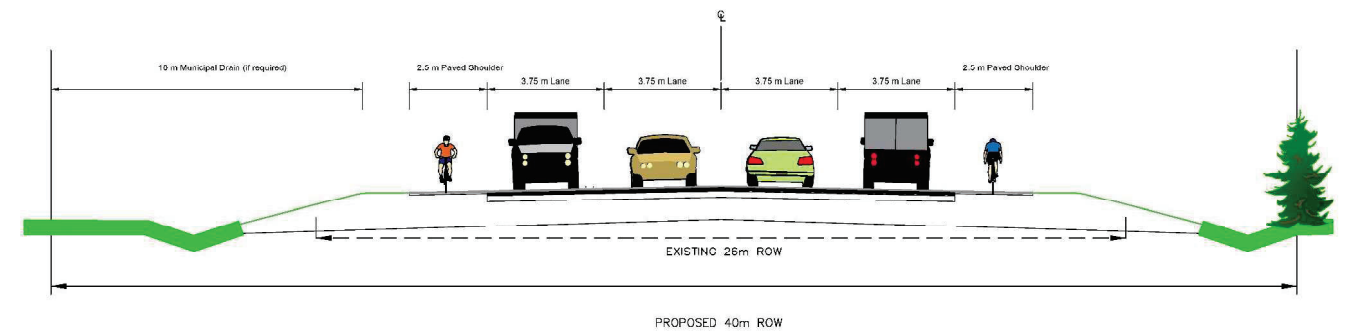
Section 3 Alternative 3 - 4-Lane Rural Cross Section
